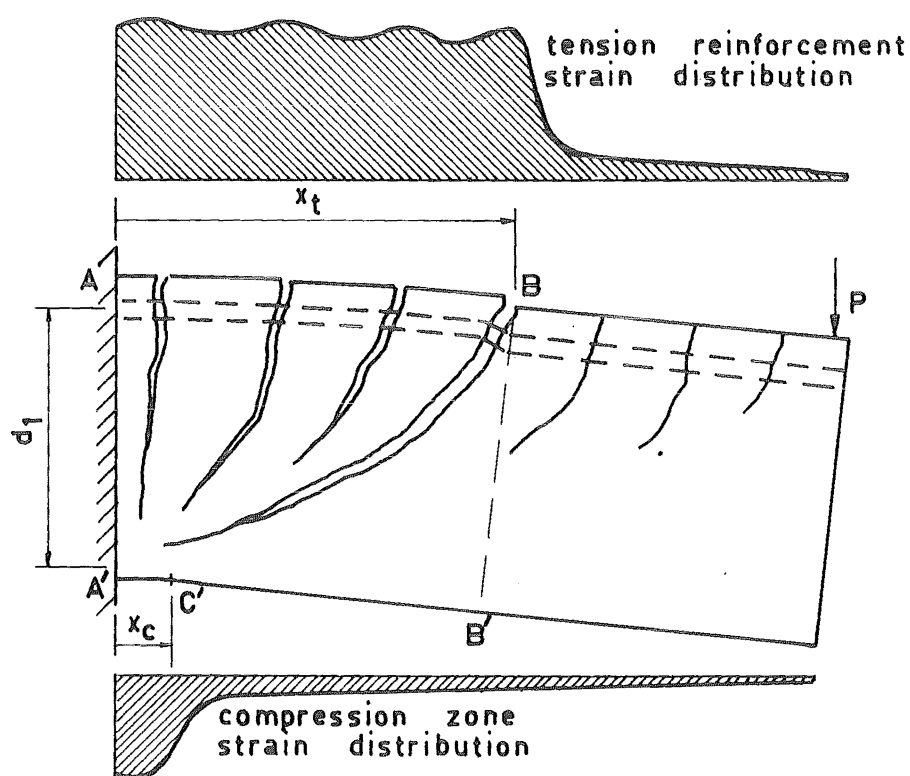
Post-Elastic Deformations of a Cantilever Containing a Diagonal Crack
